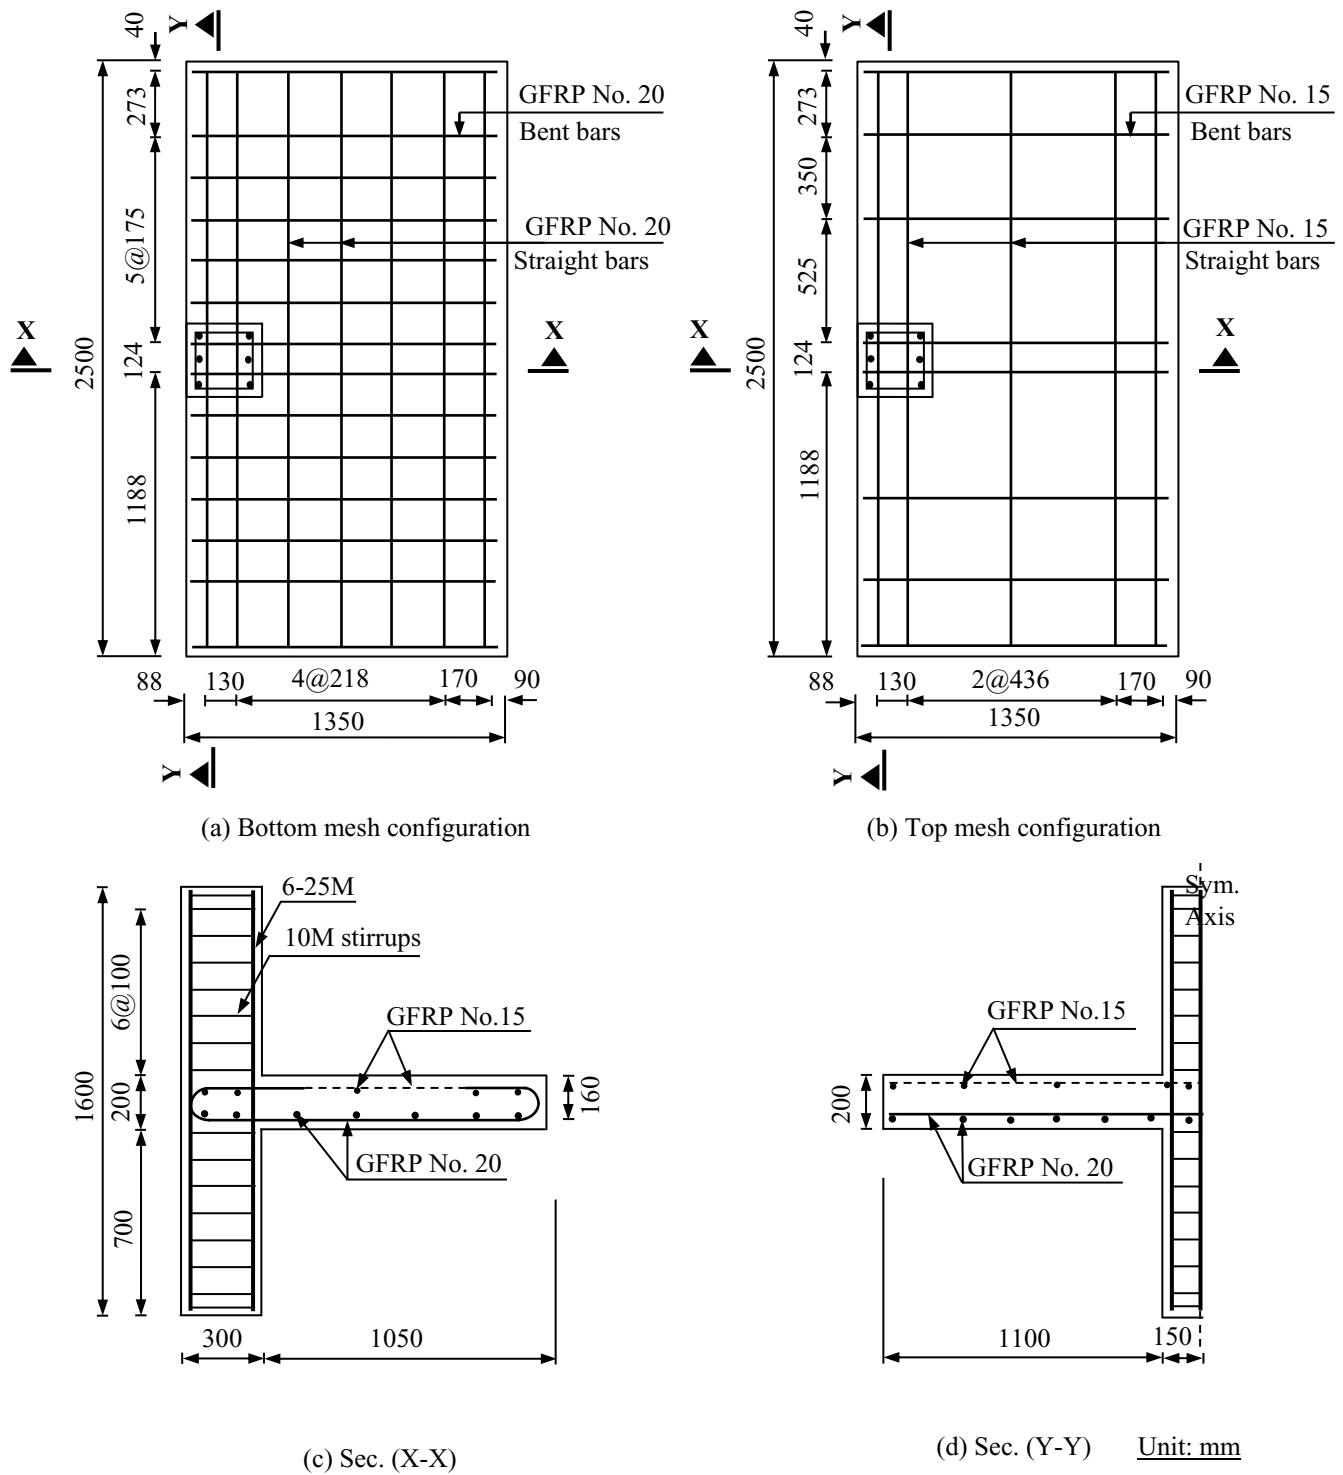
Flexural reinforcement details of specimens without shear reinforcement
